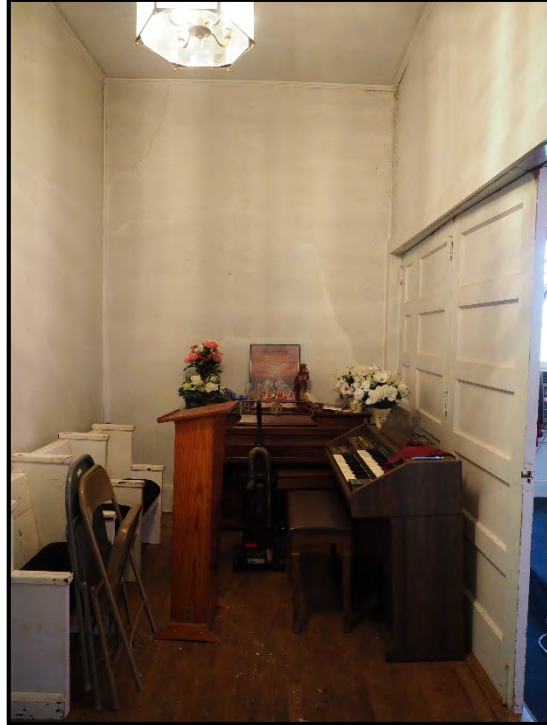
Detail of the first room of the addition accessible from the sanctuary. The room serves as a storage area and classroom.
